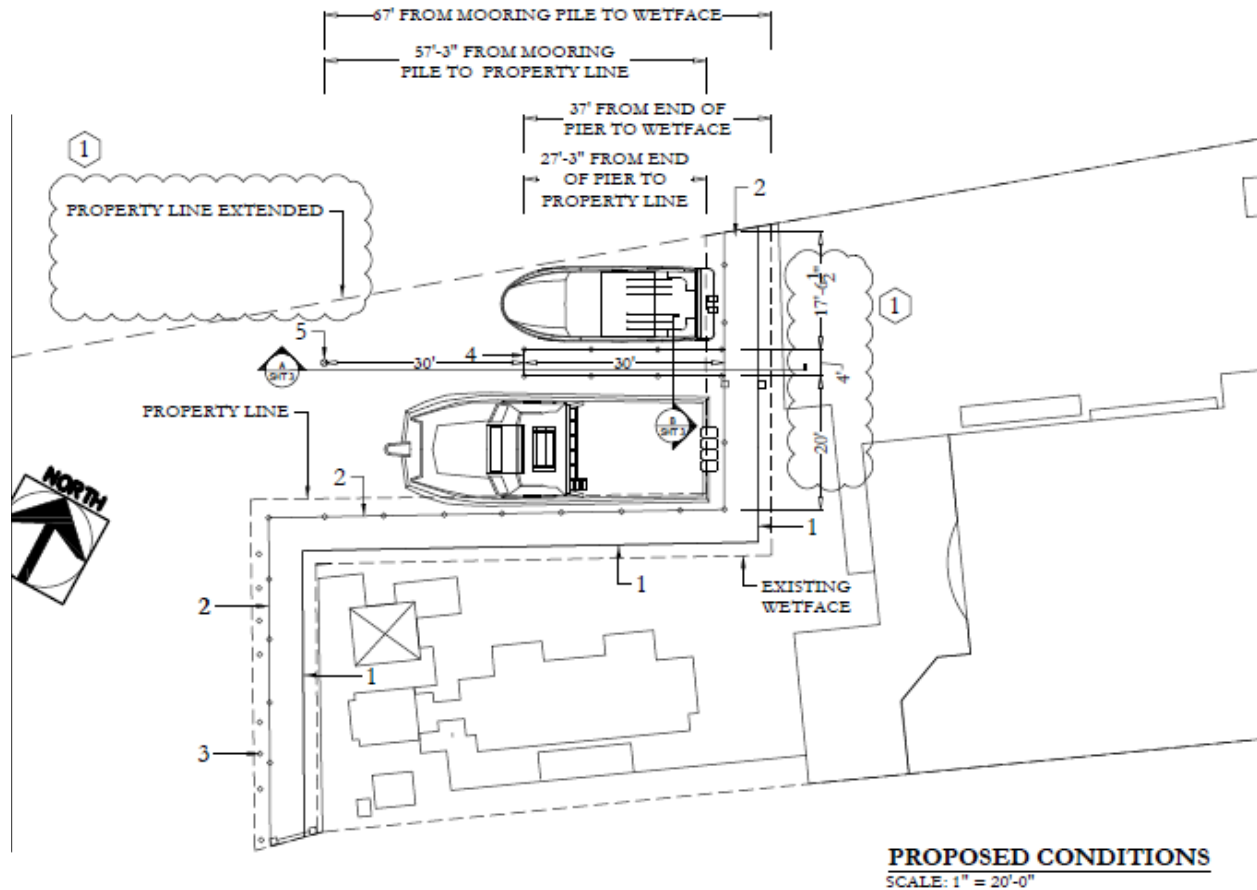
Proposed Finger Pier and Mooring Pile (per submitted plan)
